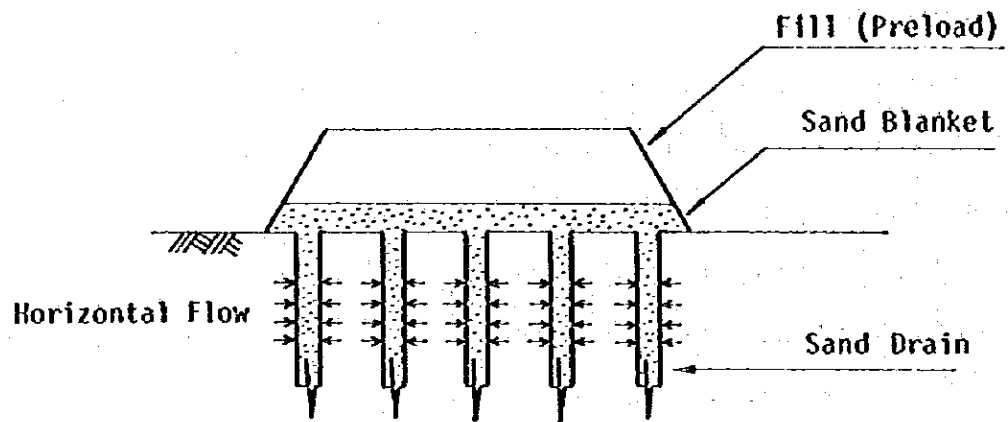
Typical Cross Section of Preloading with Sand Drain
